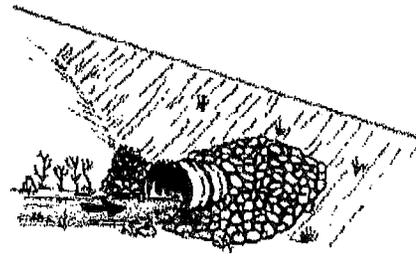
B. Riprap armor at culvert inlet (Kellar and Sherar, 2003).
